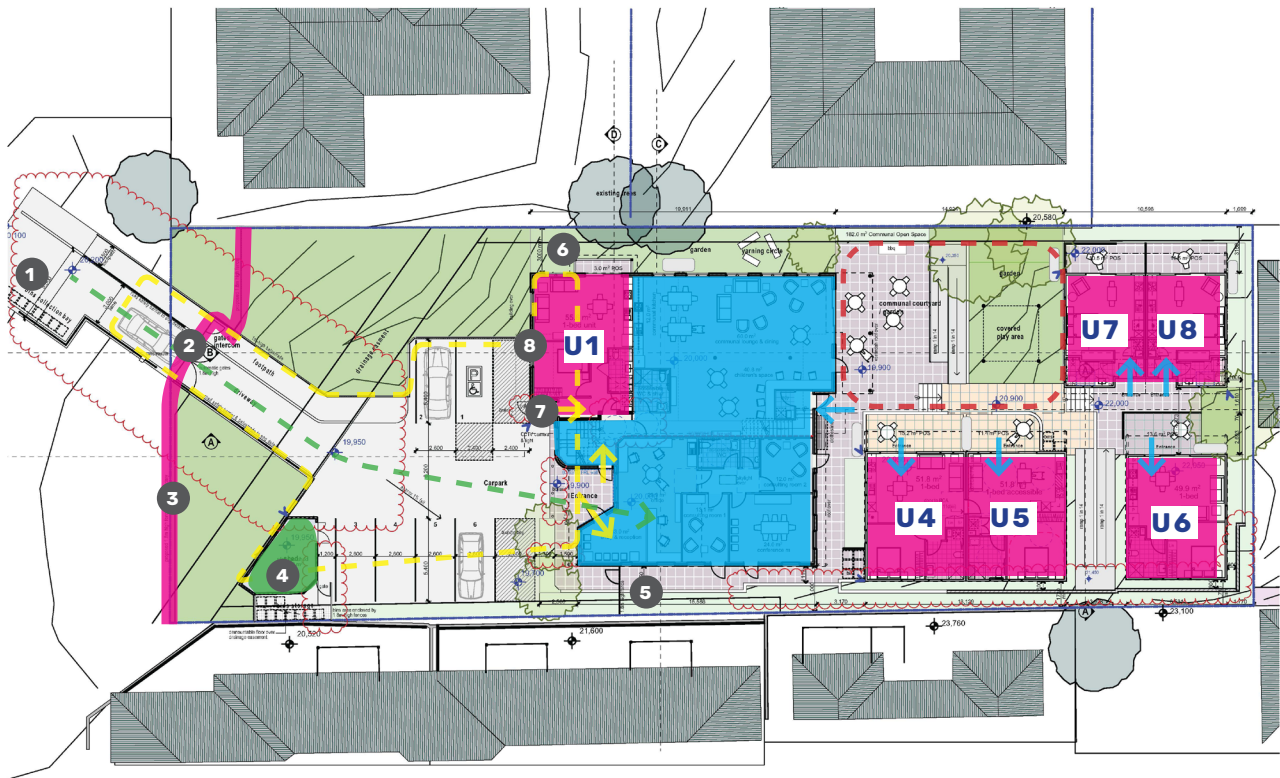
Summary Crime Prevention Assessment - Ground Floor Plan (Housing Plus/TDP 2024).
